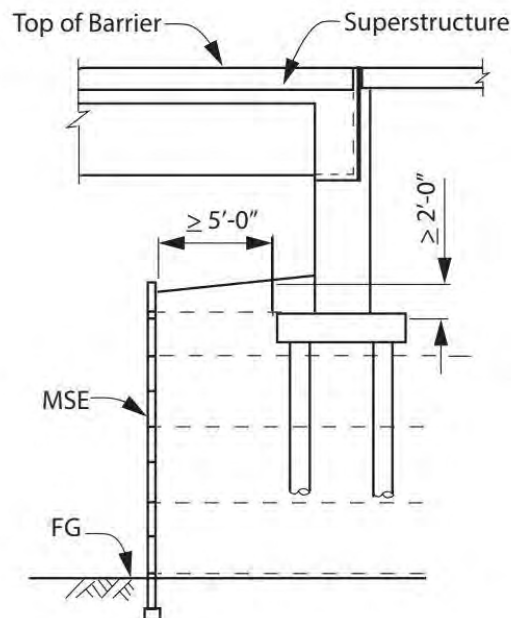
Typical geometry for Type 2 MSE bridge abutment (Caltrans 2017).
